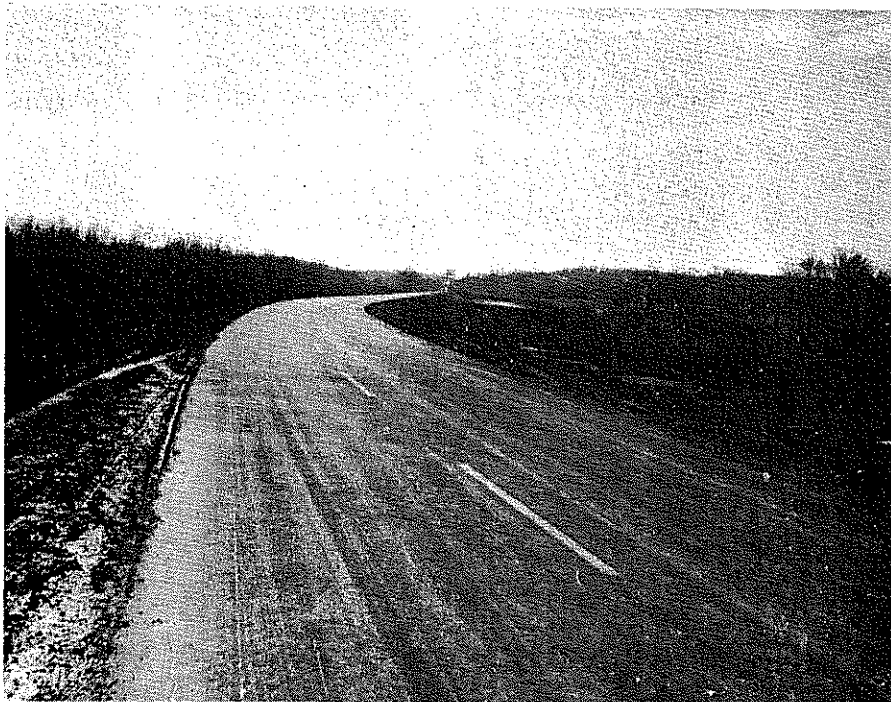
Completed pavement near the location of Fig. 17, as it appeared on February 18, 1952. The cross section, as illustrated in this photograph, was excellent throughout the project.
